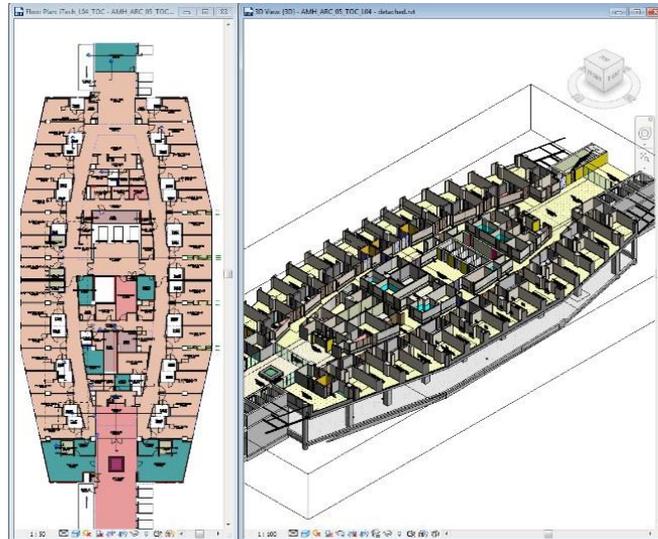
Layout and 3D view of section of fourth floor of Tower C
